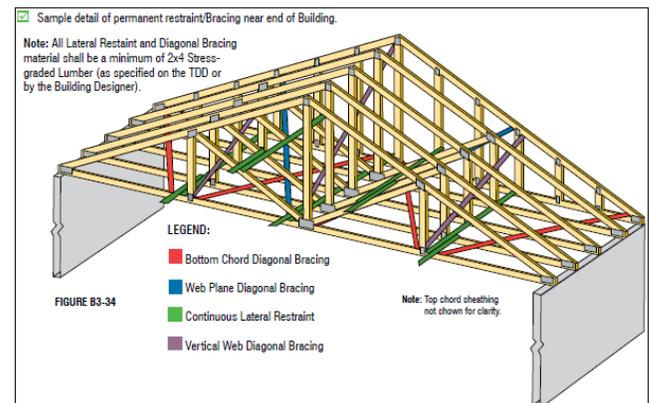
Typical permanent truss system bracing (Source: BCSI Canada).
